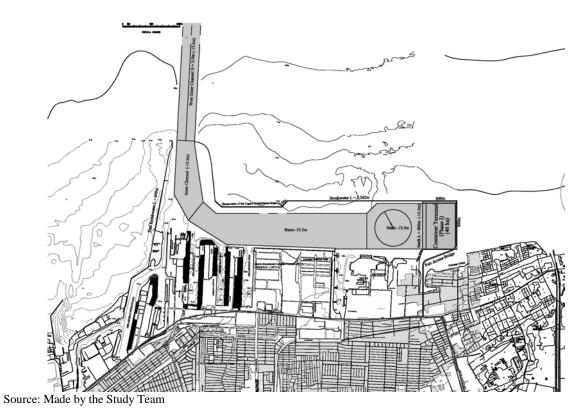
Facility Layout Plan of North Kalibaru Expansion in Phase I (Alternative-3)
